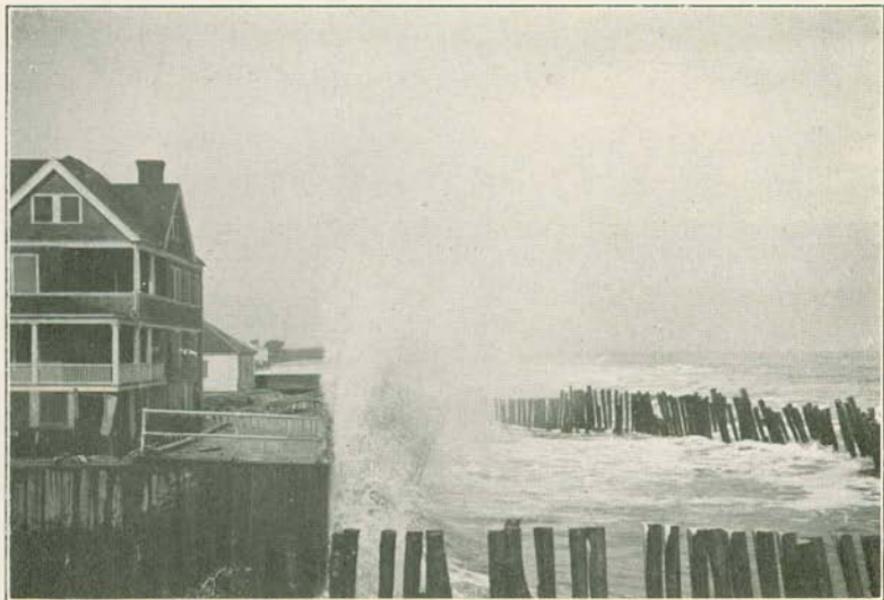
House at Monmouth Beach protected by bulkhead and outlying rows of piling. See Plate II, Fig. 2, and Plate III, Fig. 1 and 2.
